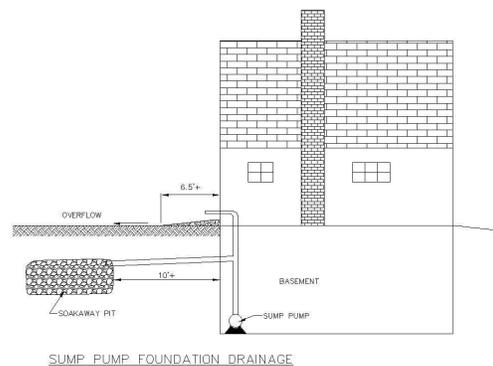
Sump Pump Drainage to Soakaway Pit Detail
